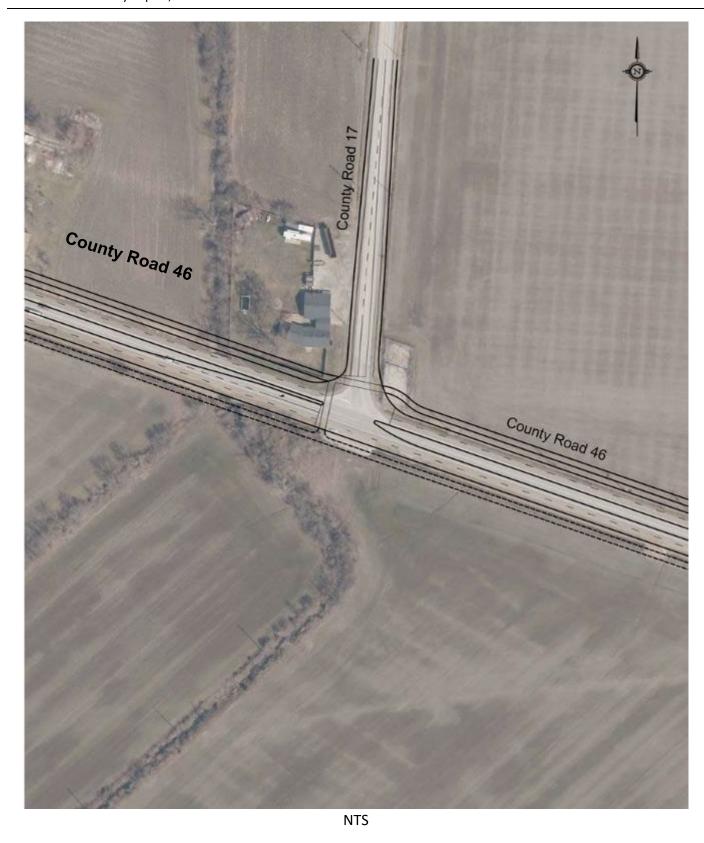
County Road 46 and County Road 17 Intersection Alternative A
